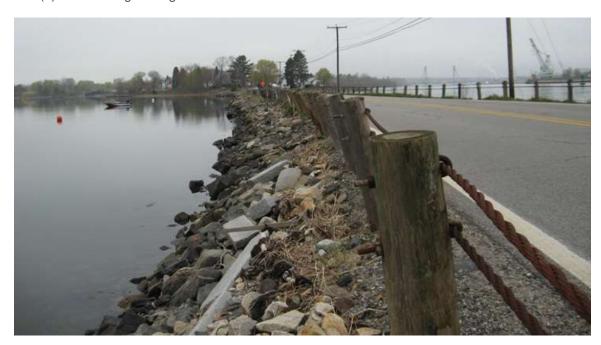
U.S. Route 1B causeway in New Castle, NH (photo courtesy of New Hampshire DOT).
